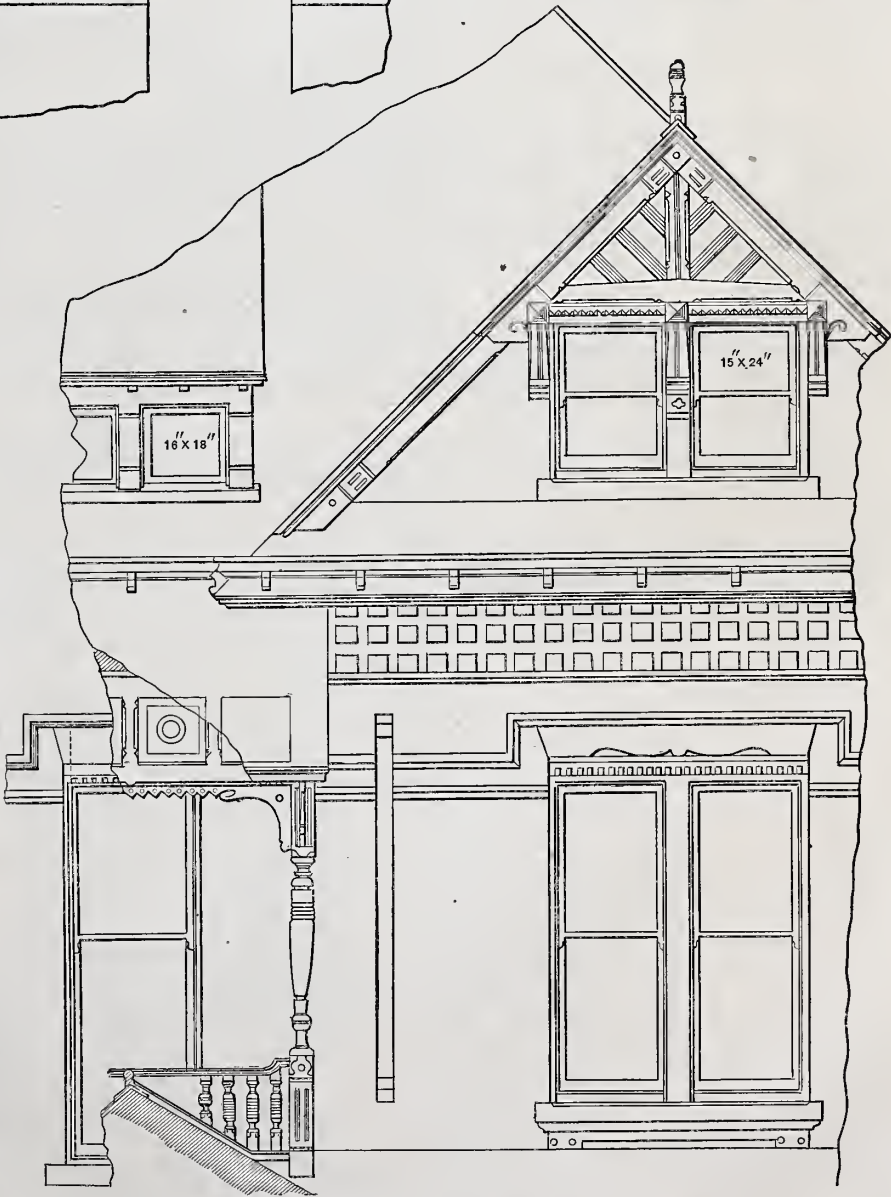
Elevation of Front Gable.—Scale, 1/4 Inch to the Foot.
